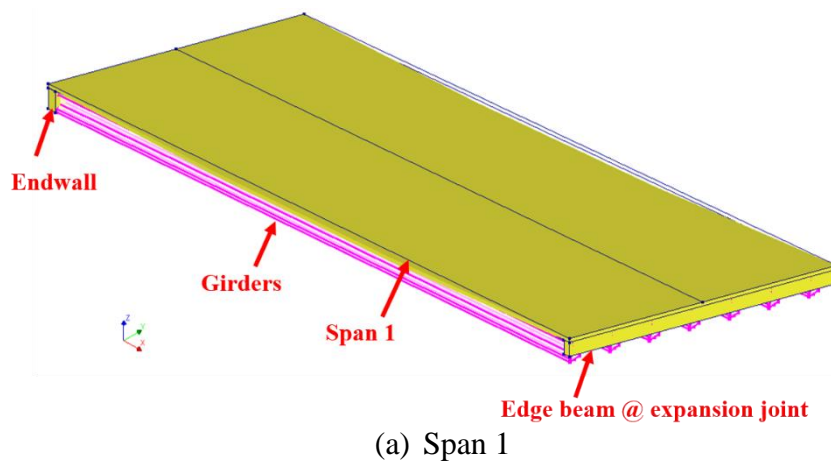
Bridge model showing structural components of the SR299 bridge.
